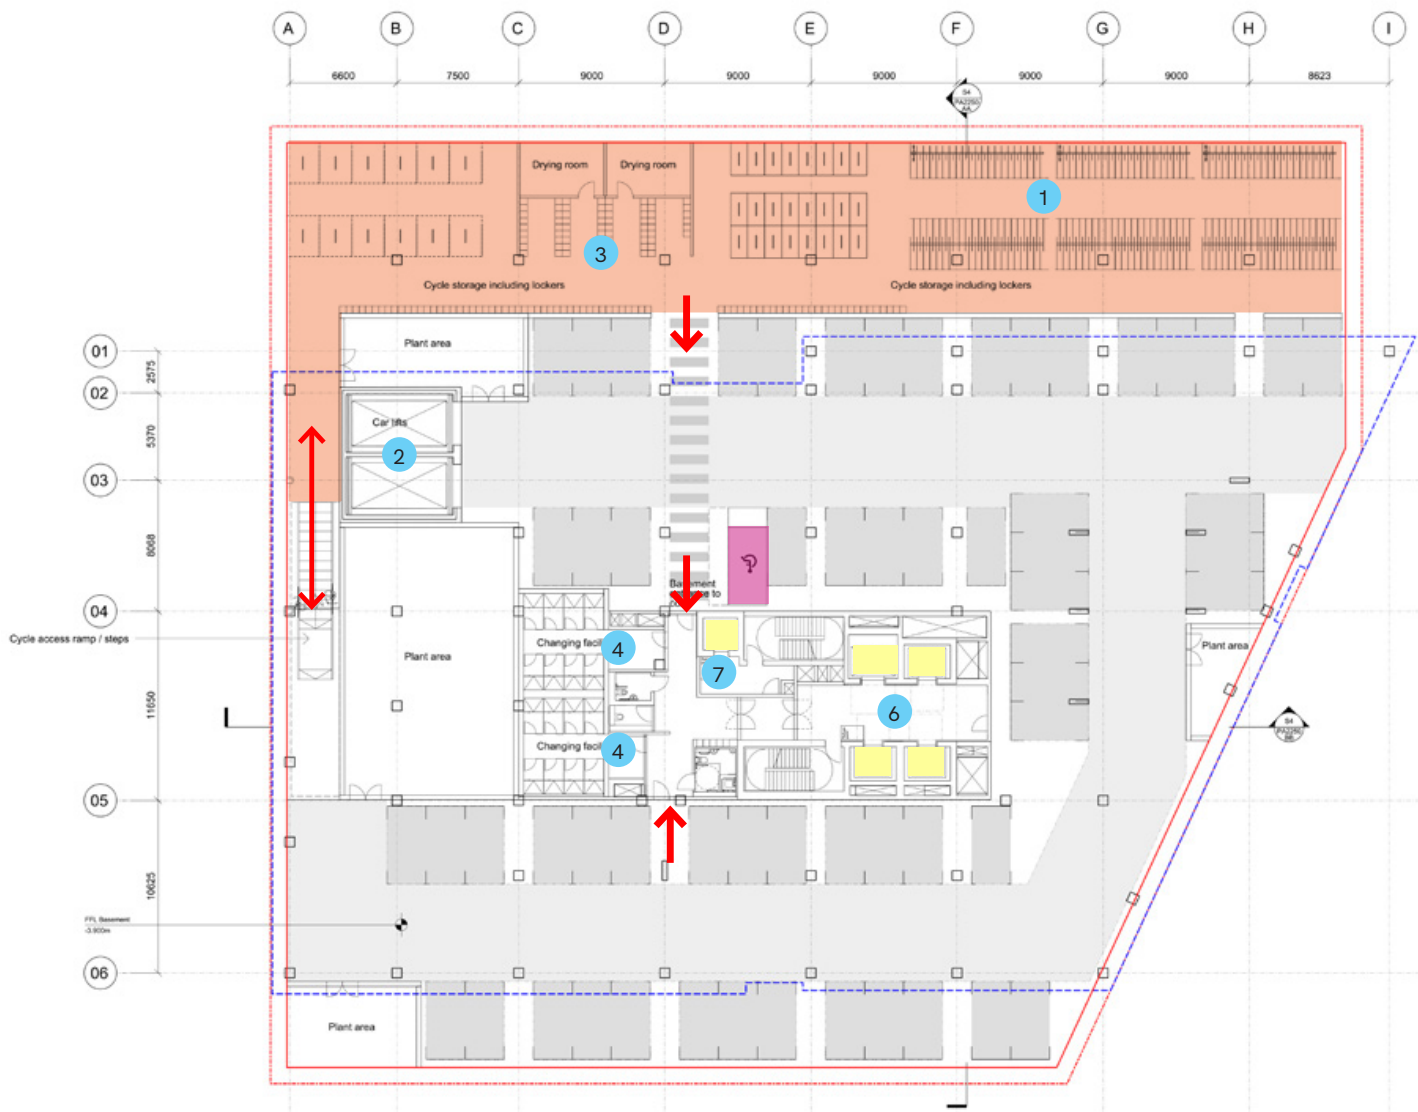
Basement plan showing access and movement strategy (CD2.65).
